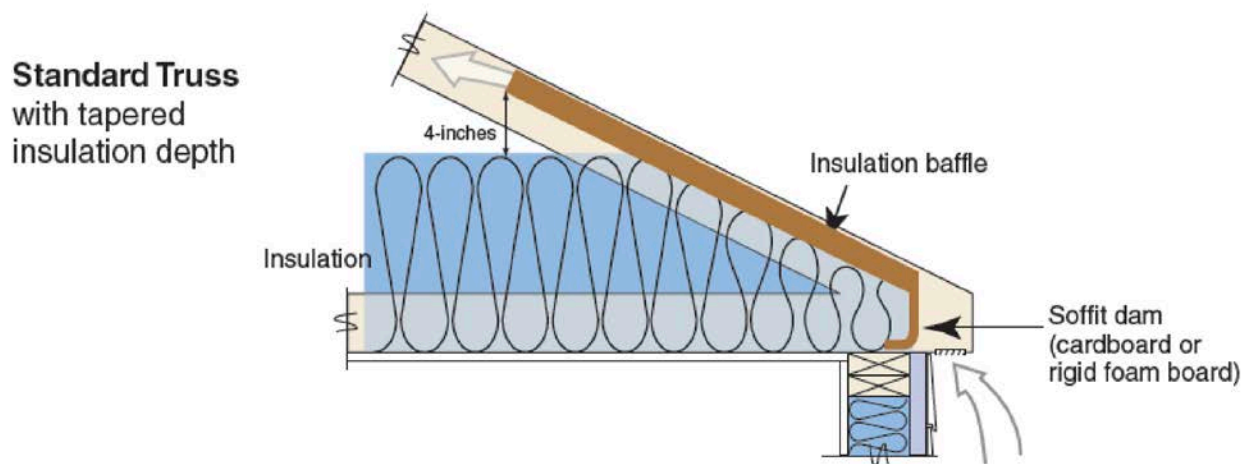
Standard roof trusses are narrow at the eaves, preventing full insulation thickness over the top plate of the exterior walls.
